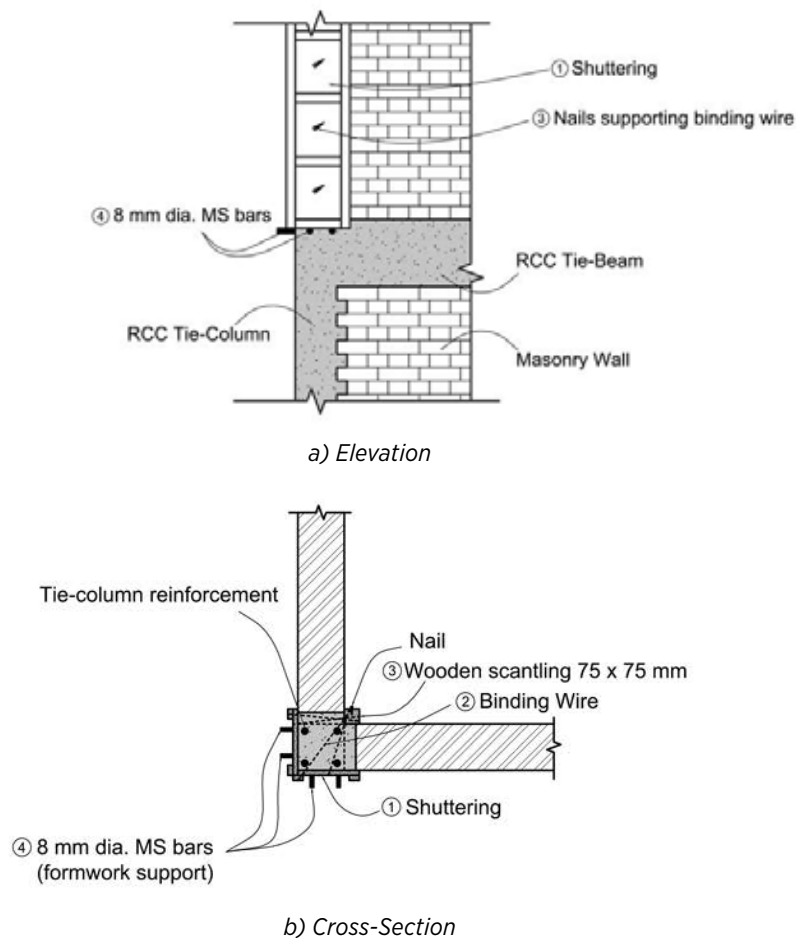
Formwork for RC tie-columns at the ground floor and upper floor levels.
